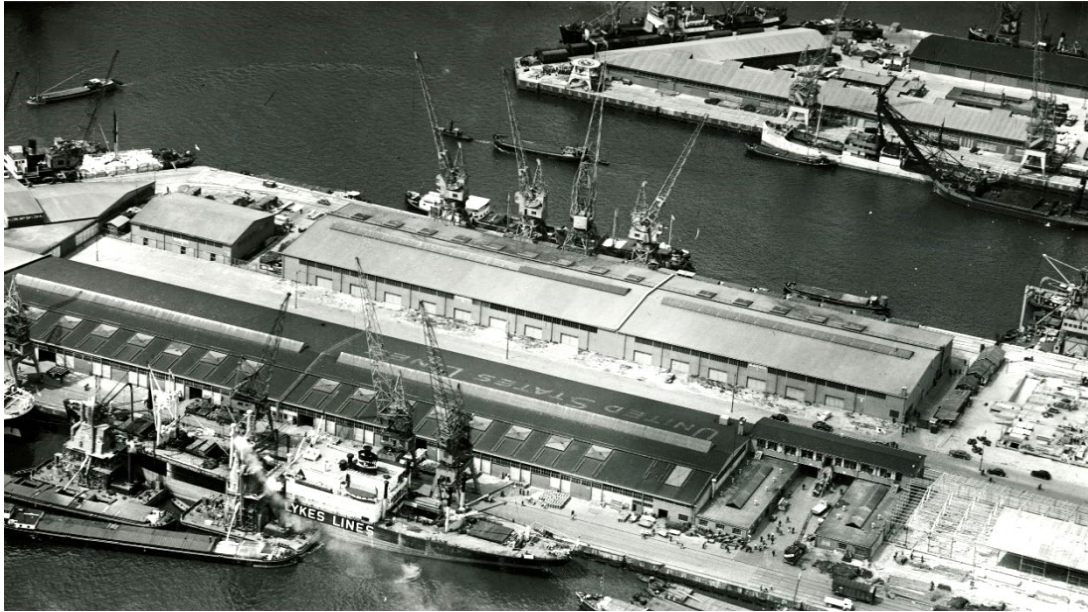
Warehouses and the gateway building of C.S.S.M and construction of warehouses D and E (Source: Stadsarchief Rotterdam)
